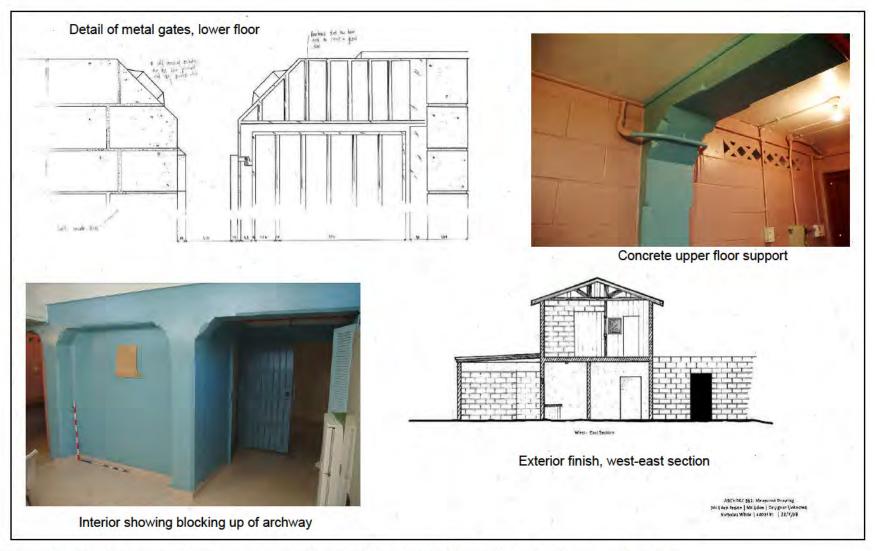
West-East cross-section (exterior surfaces) of the Gymnasium building and details of interior of lower floor
